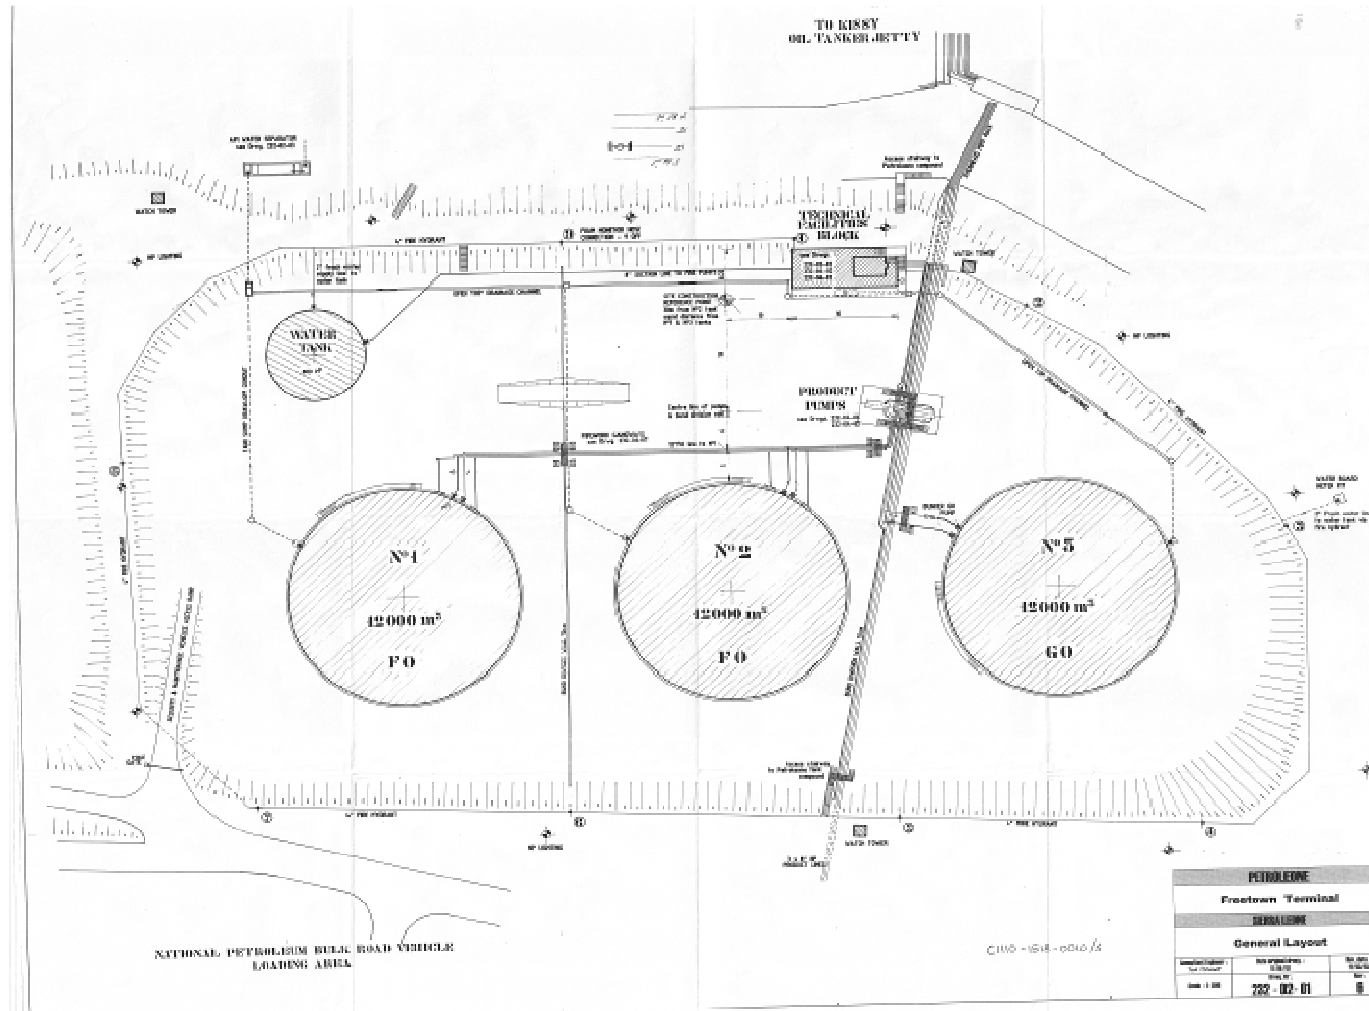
Layout sketch of the Kissy Petroleone storage facility in the Freetown Terminal.
